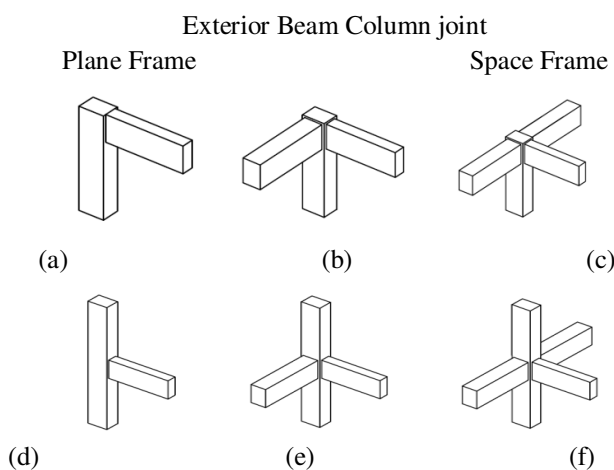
Exterior beam-column joint in plane and space frame - (a) Plane frame roof corner joint (b) Space frame roof corner joint (c) Space frame roof edge joint (d) Plane frame floor corner joint (e) Space frame floor corner joint (f) Space frame floor edge joint [9]
